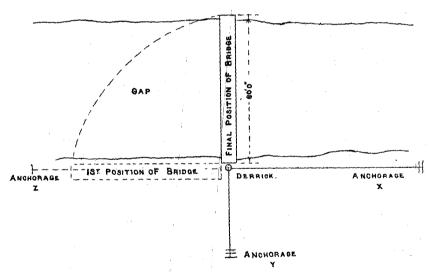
Plan of Launching Arrangements—Bangalore Girder—" Method B."
